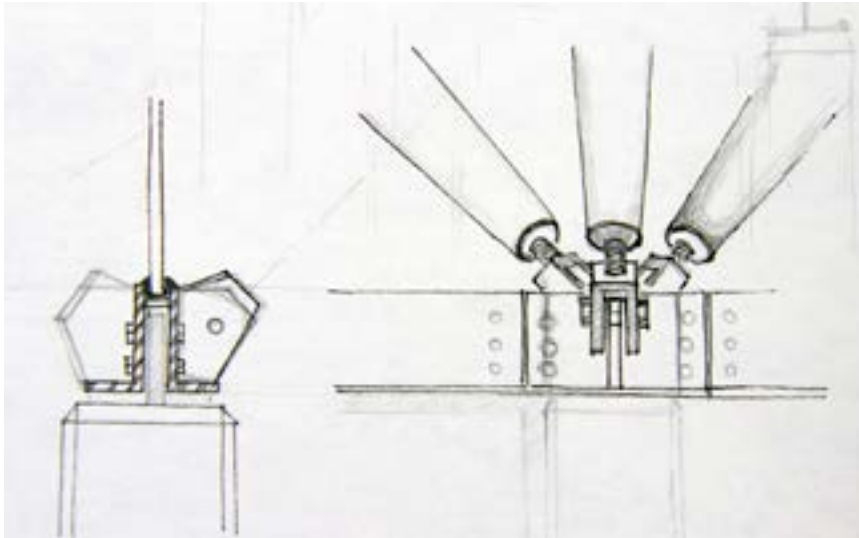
Sketch indicating the use of “lighter” and “heavier” elements in the portal frame construction. Author, 2014.
